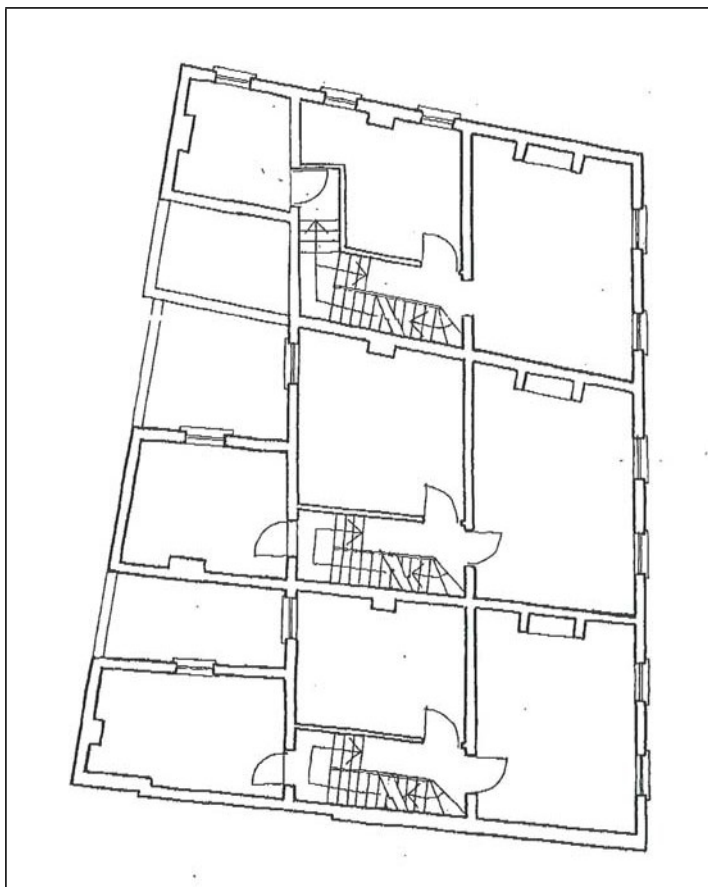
1895 field sketch plan indicating the original form of the buildings. The three open yards to the northern site boundary (at left) are clear.
